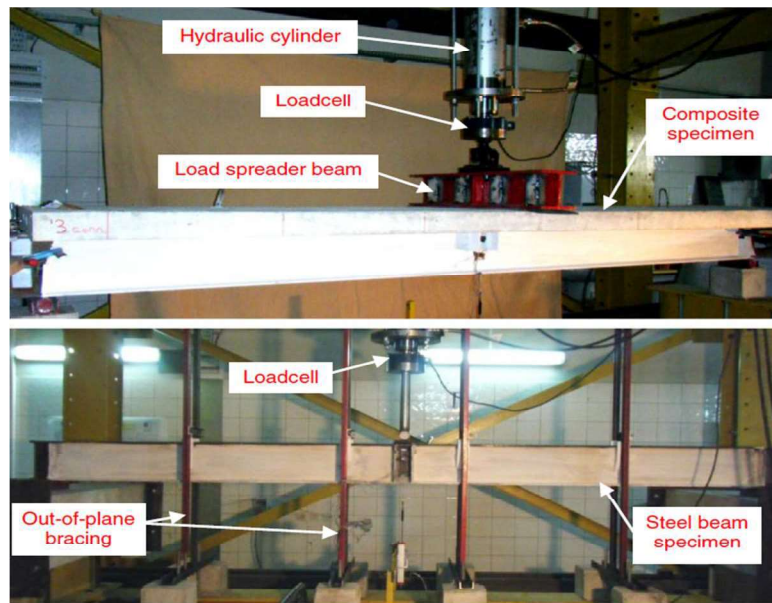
Details of test specimens of composite beam (upper part) and bare steel beam (bottom part) (Baran & Topkaya, 2014)
